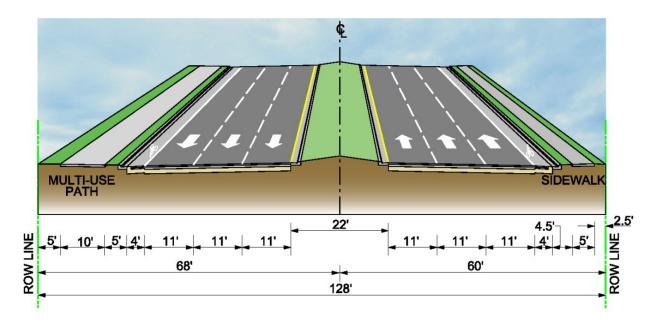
SIX-LANE DIVIDED URBAN TYPICAL SECTION FUTURE MCKENDREE ROAD REALIGNMENT TO FUTURE EPPERSON RANCH BOULEVARD
